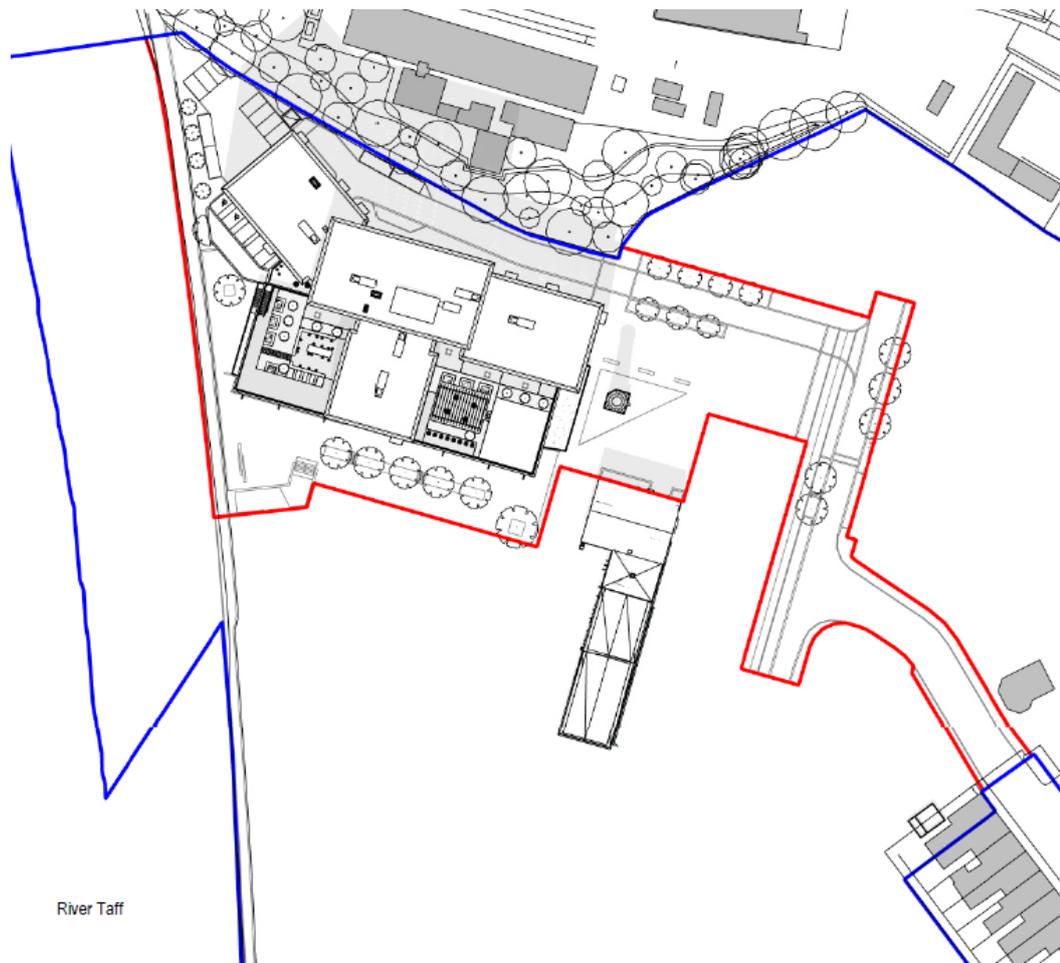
Internal site layout including 'Chimney Square' and 'Boulevard'
